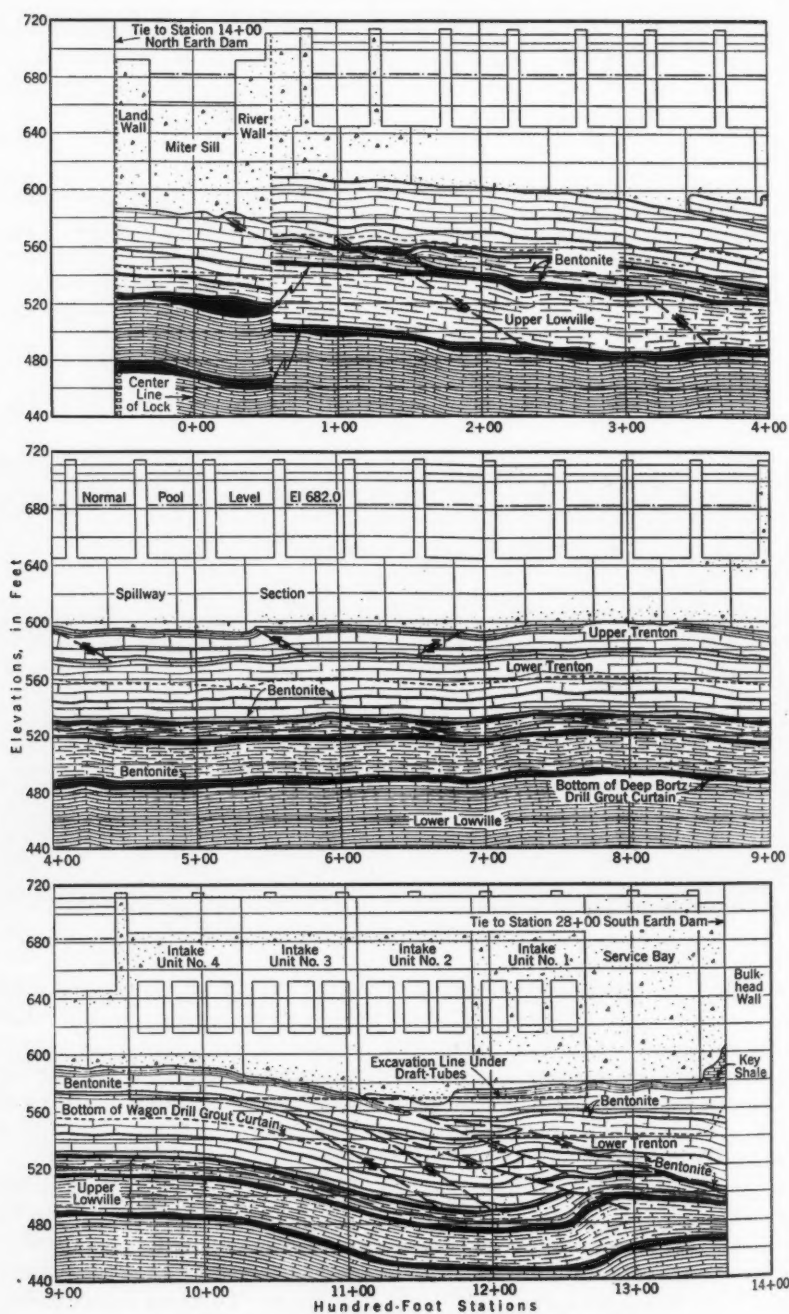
PROFILE OF POWER HOUSE, SPILLWAY, AND MITER SILL
